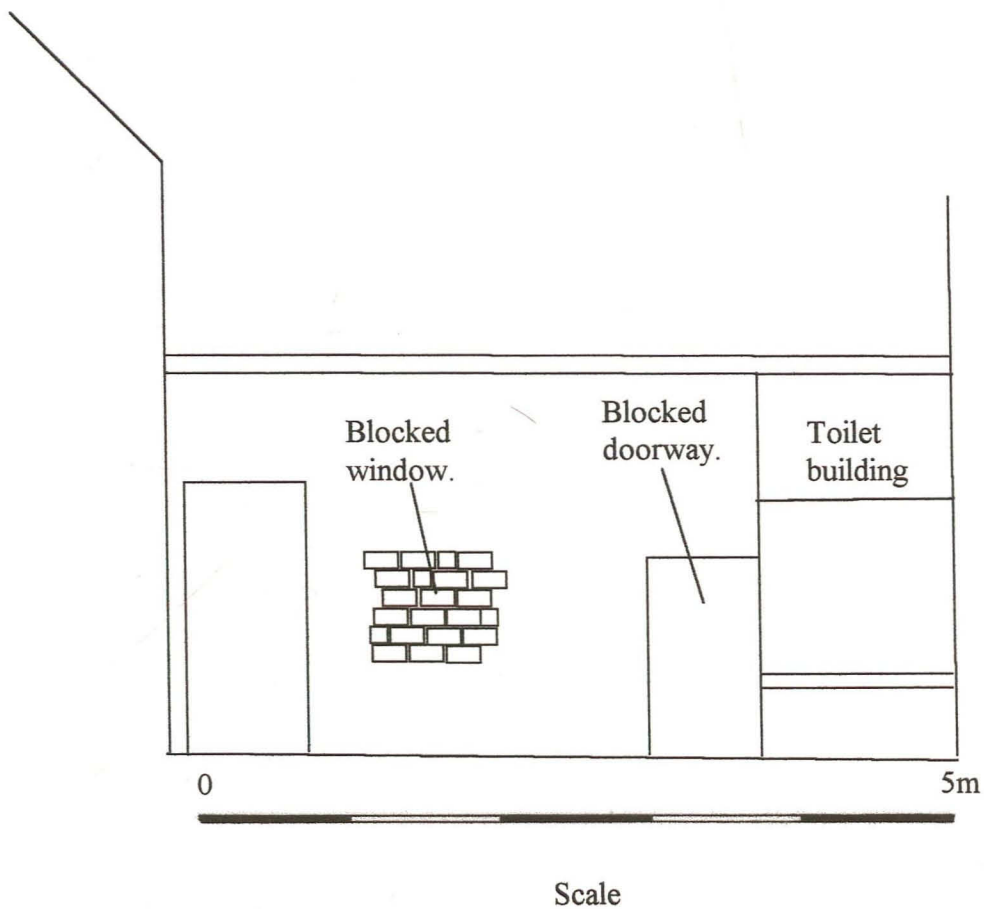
South facing elevation. Shows blocked window in first phase of building and later blocked doorway. Interface between phases (001) and (006) not visible externally. 1:50
